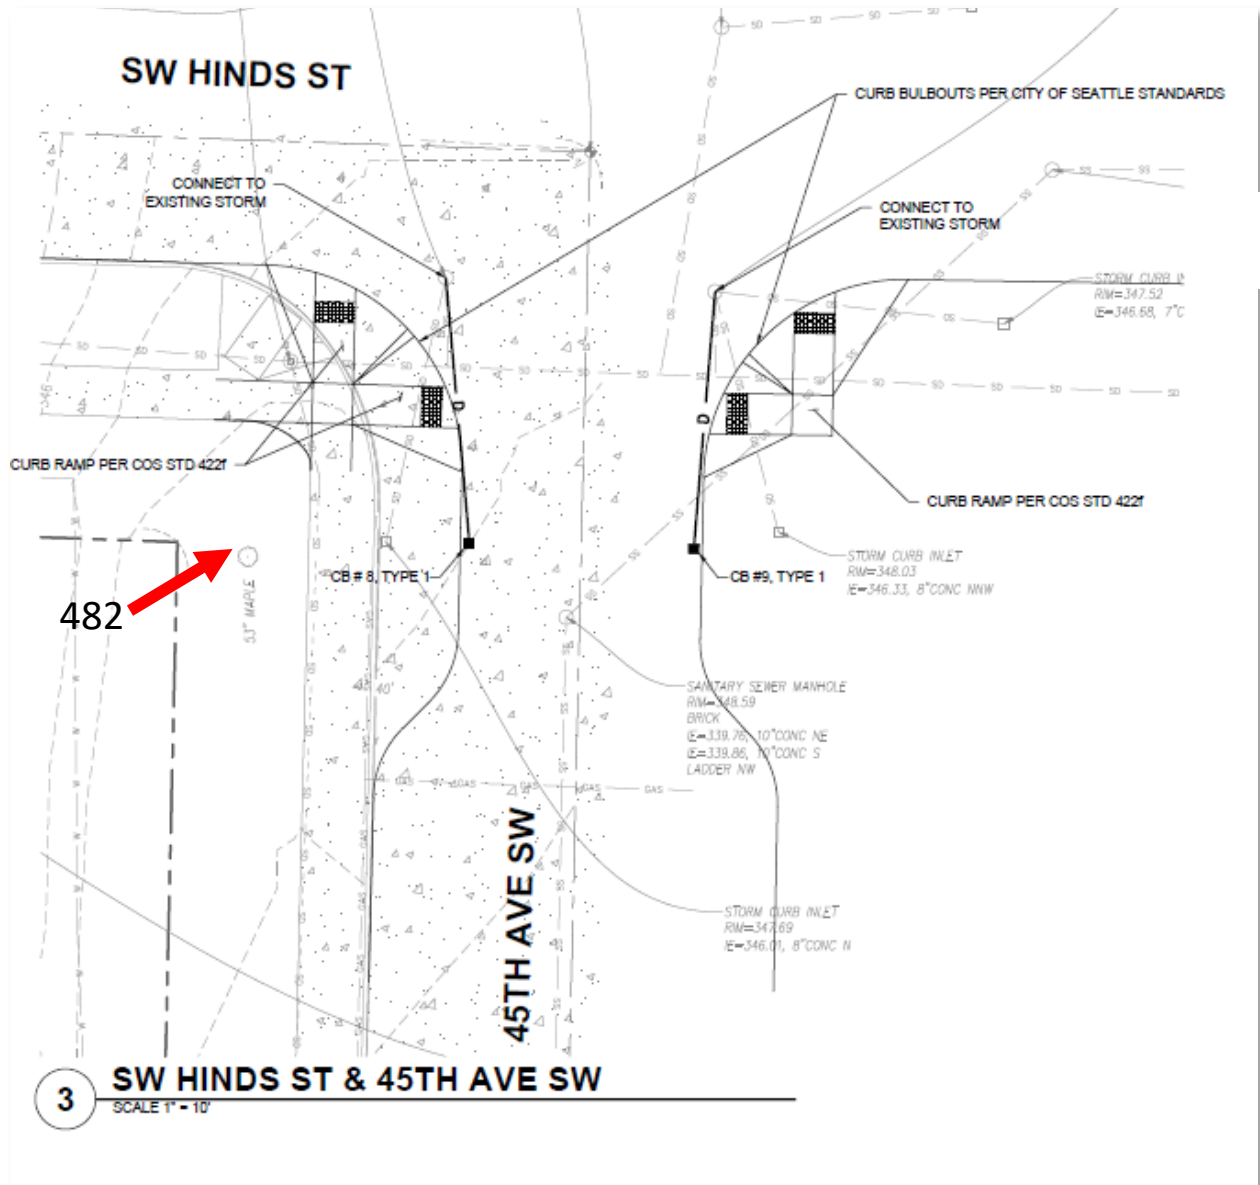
Section of the Street Improvement Plan C-200 showing the location of tree 482 (Dated 07.15.2020). The tree is located off of the property in the city right-of-way. New curb cuts are proposed to the northeast of the tree within the existing walkway and a proposed curb bulbout.
